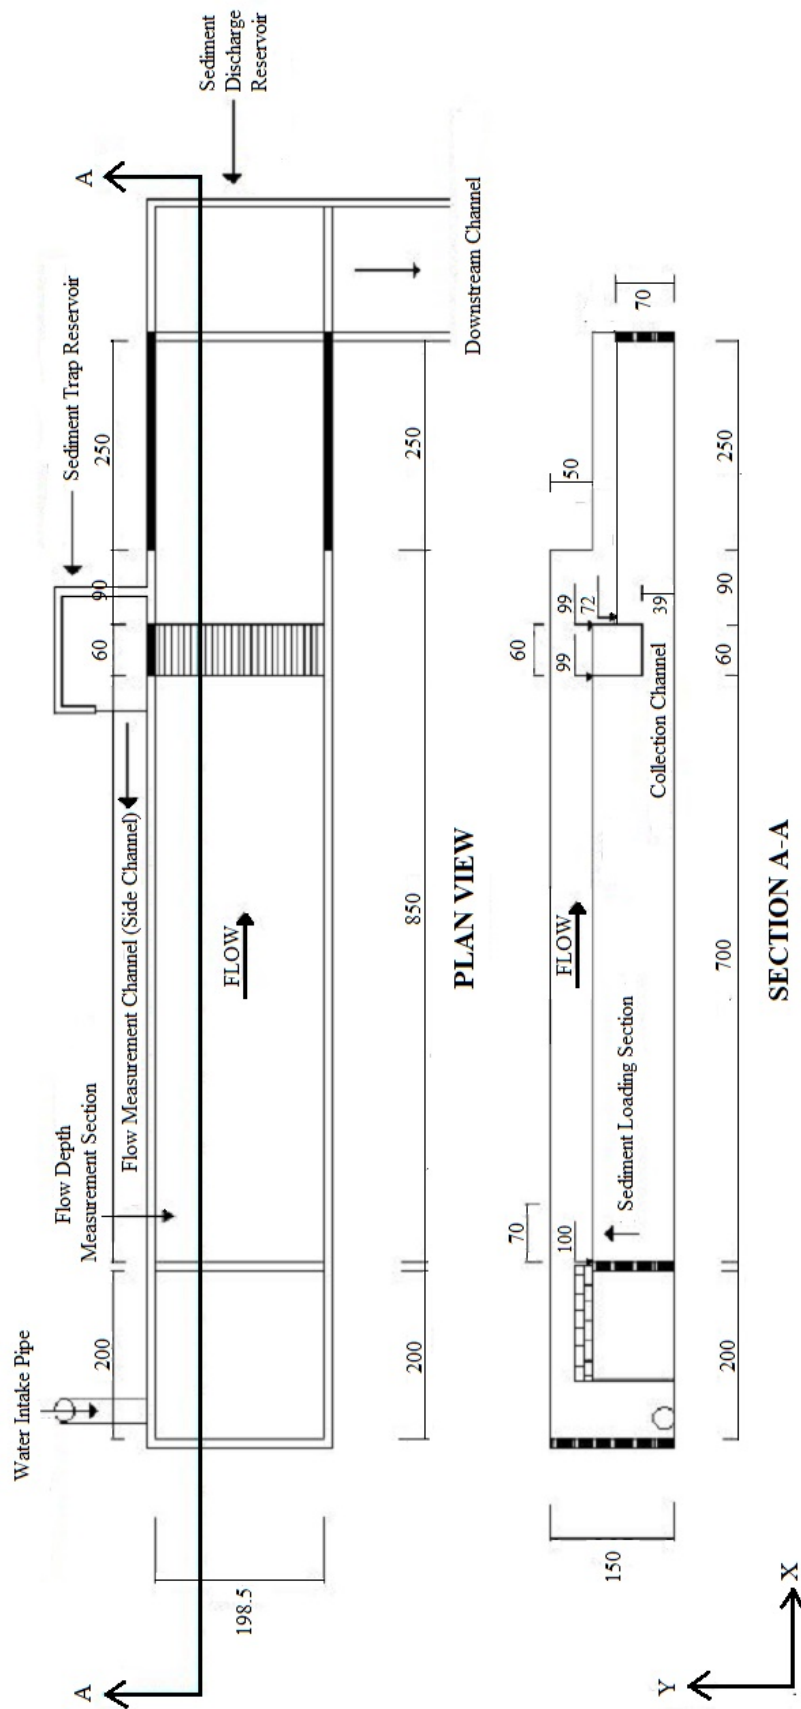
Plan and section views of the constructed Tyrolean weir model (units are in cm)
